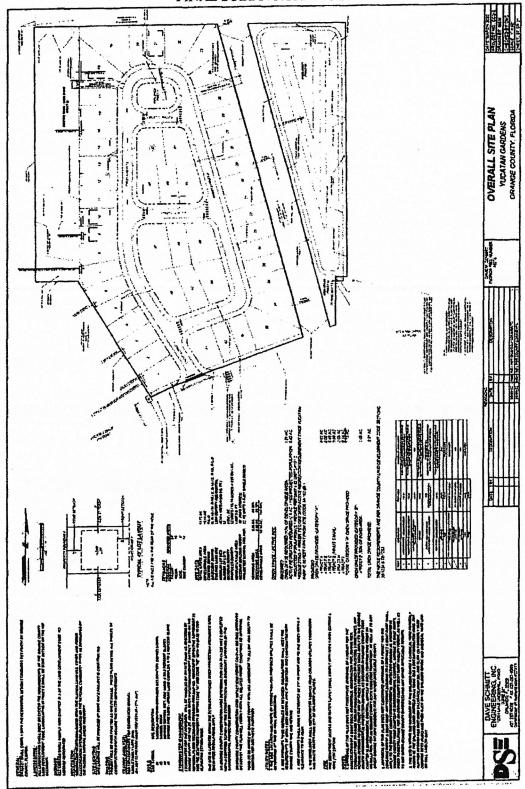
" FINAL SUBDIVISION PLAN
